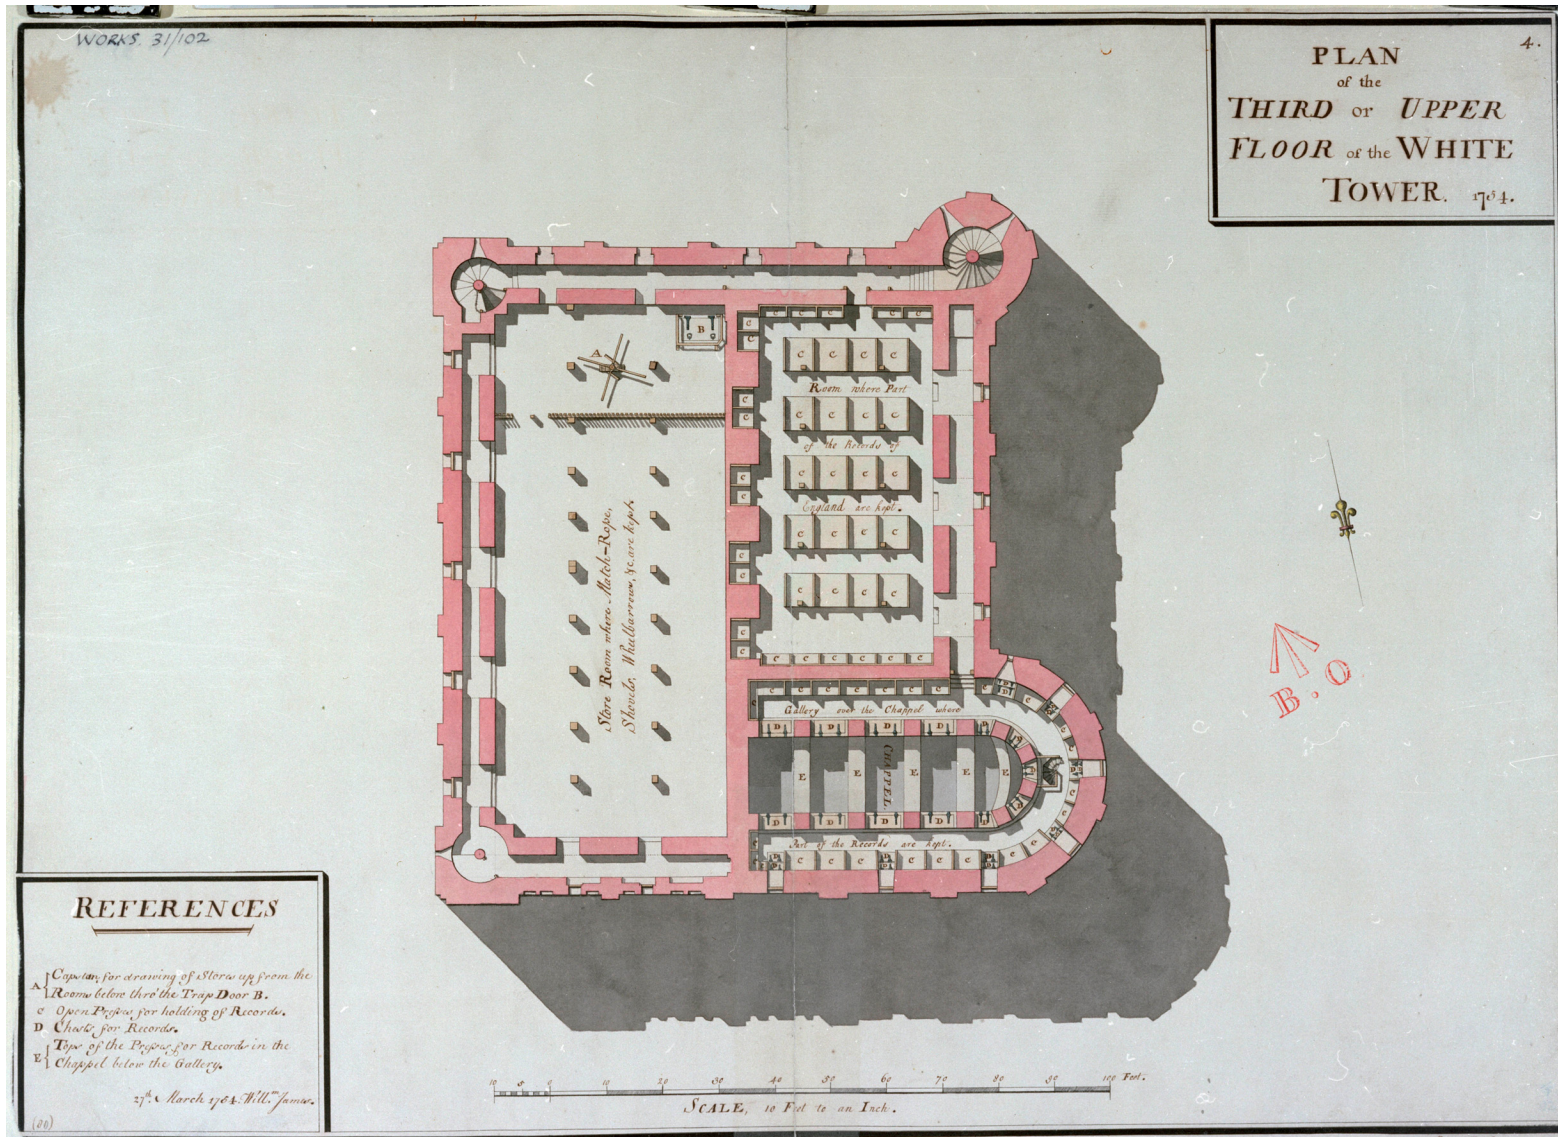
Second-floor plan by Lemprière in 1754 (TNA WORK31/102, copyright The National Archives)
